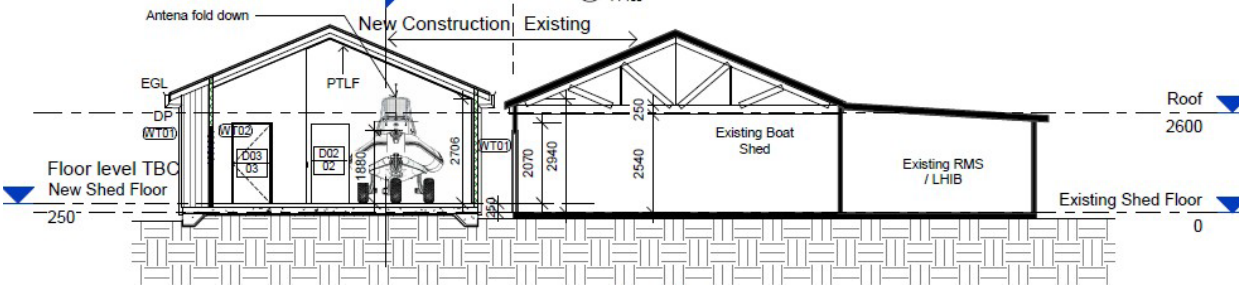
Applicant's submitted Elevations of proposed Marine Rescue NSW building and adjoining building.
